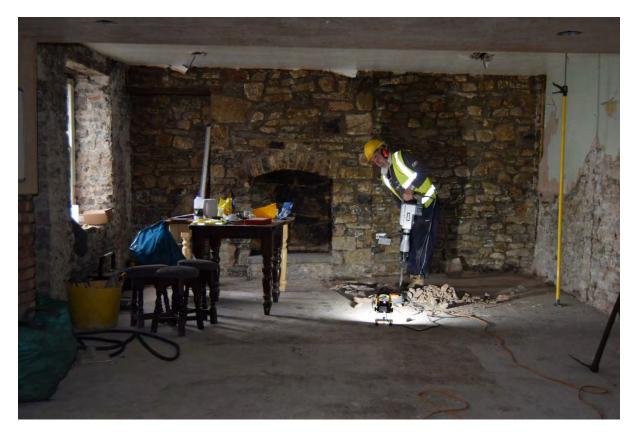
Phase 1 works within the building, showing excavation of test pits in progress and the fireplace against the western wall. Looking west.
